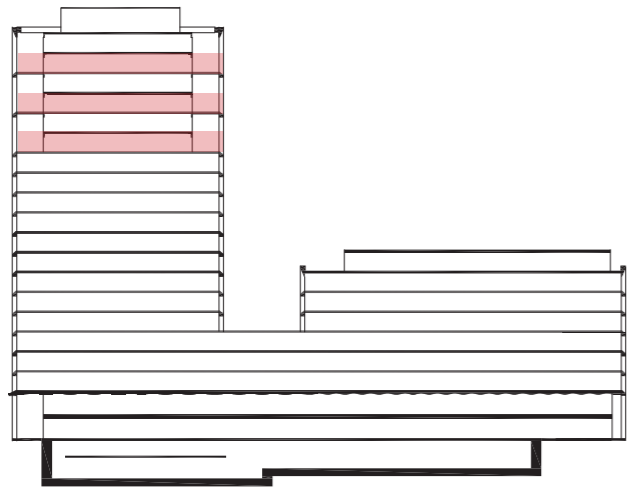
Fourteenth, sixteenth and eighteenth floor plan
